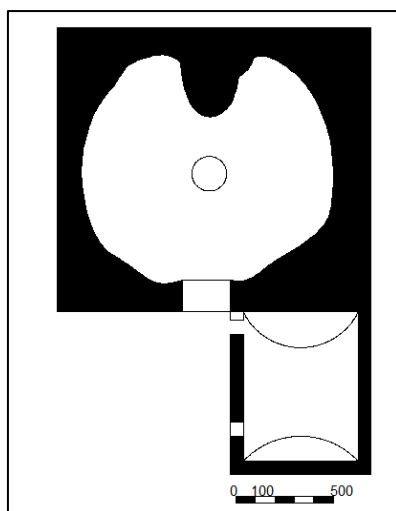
Plan Drawing of Eymir Khan (Author's archive)
